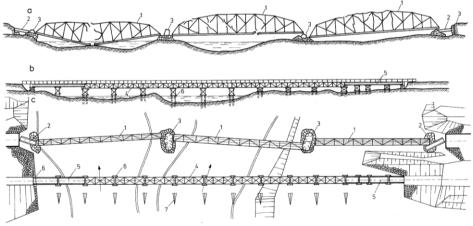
Bypass bridge (Miklin & Sawicki, 1993): a - side view of the destroyed permanent bridge, b - side view of the temporary (bypass) bridge, c - top view of the destroyed bridge and location of the bypass bridge; 1 - destroyed lattice spans,
